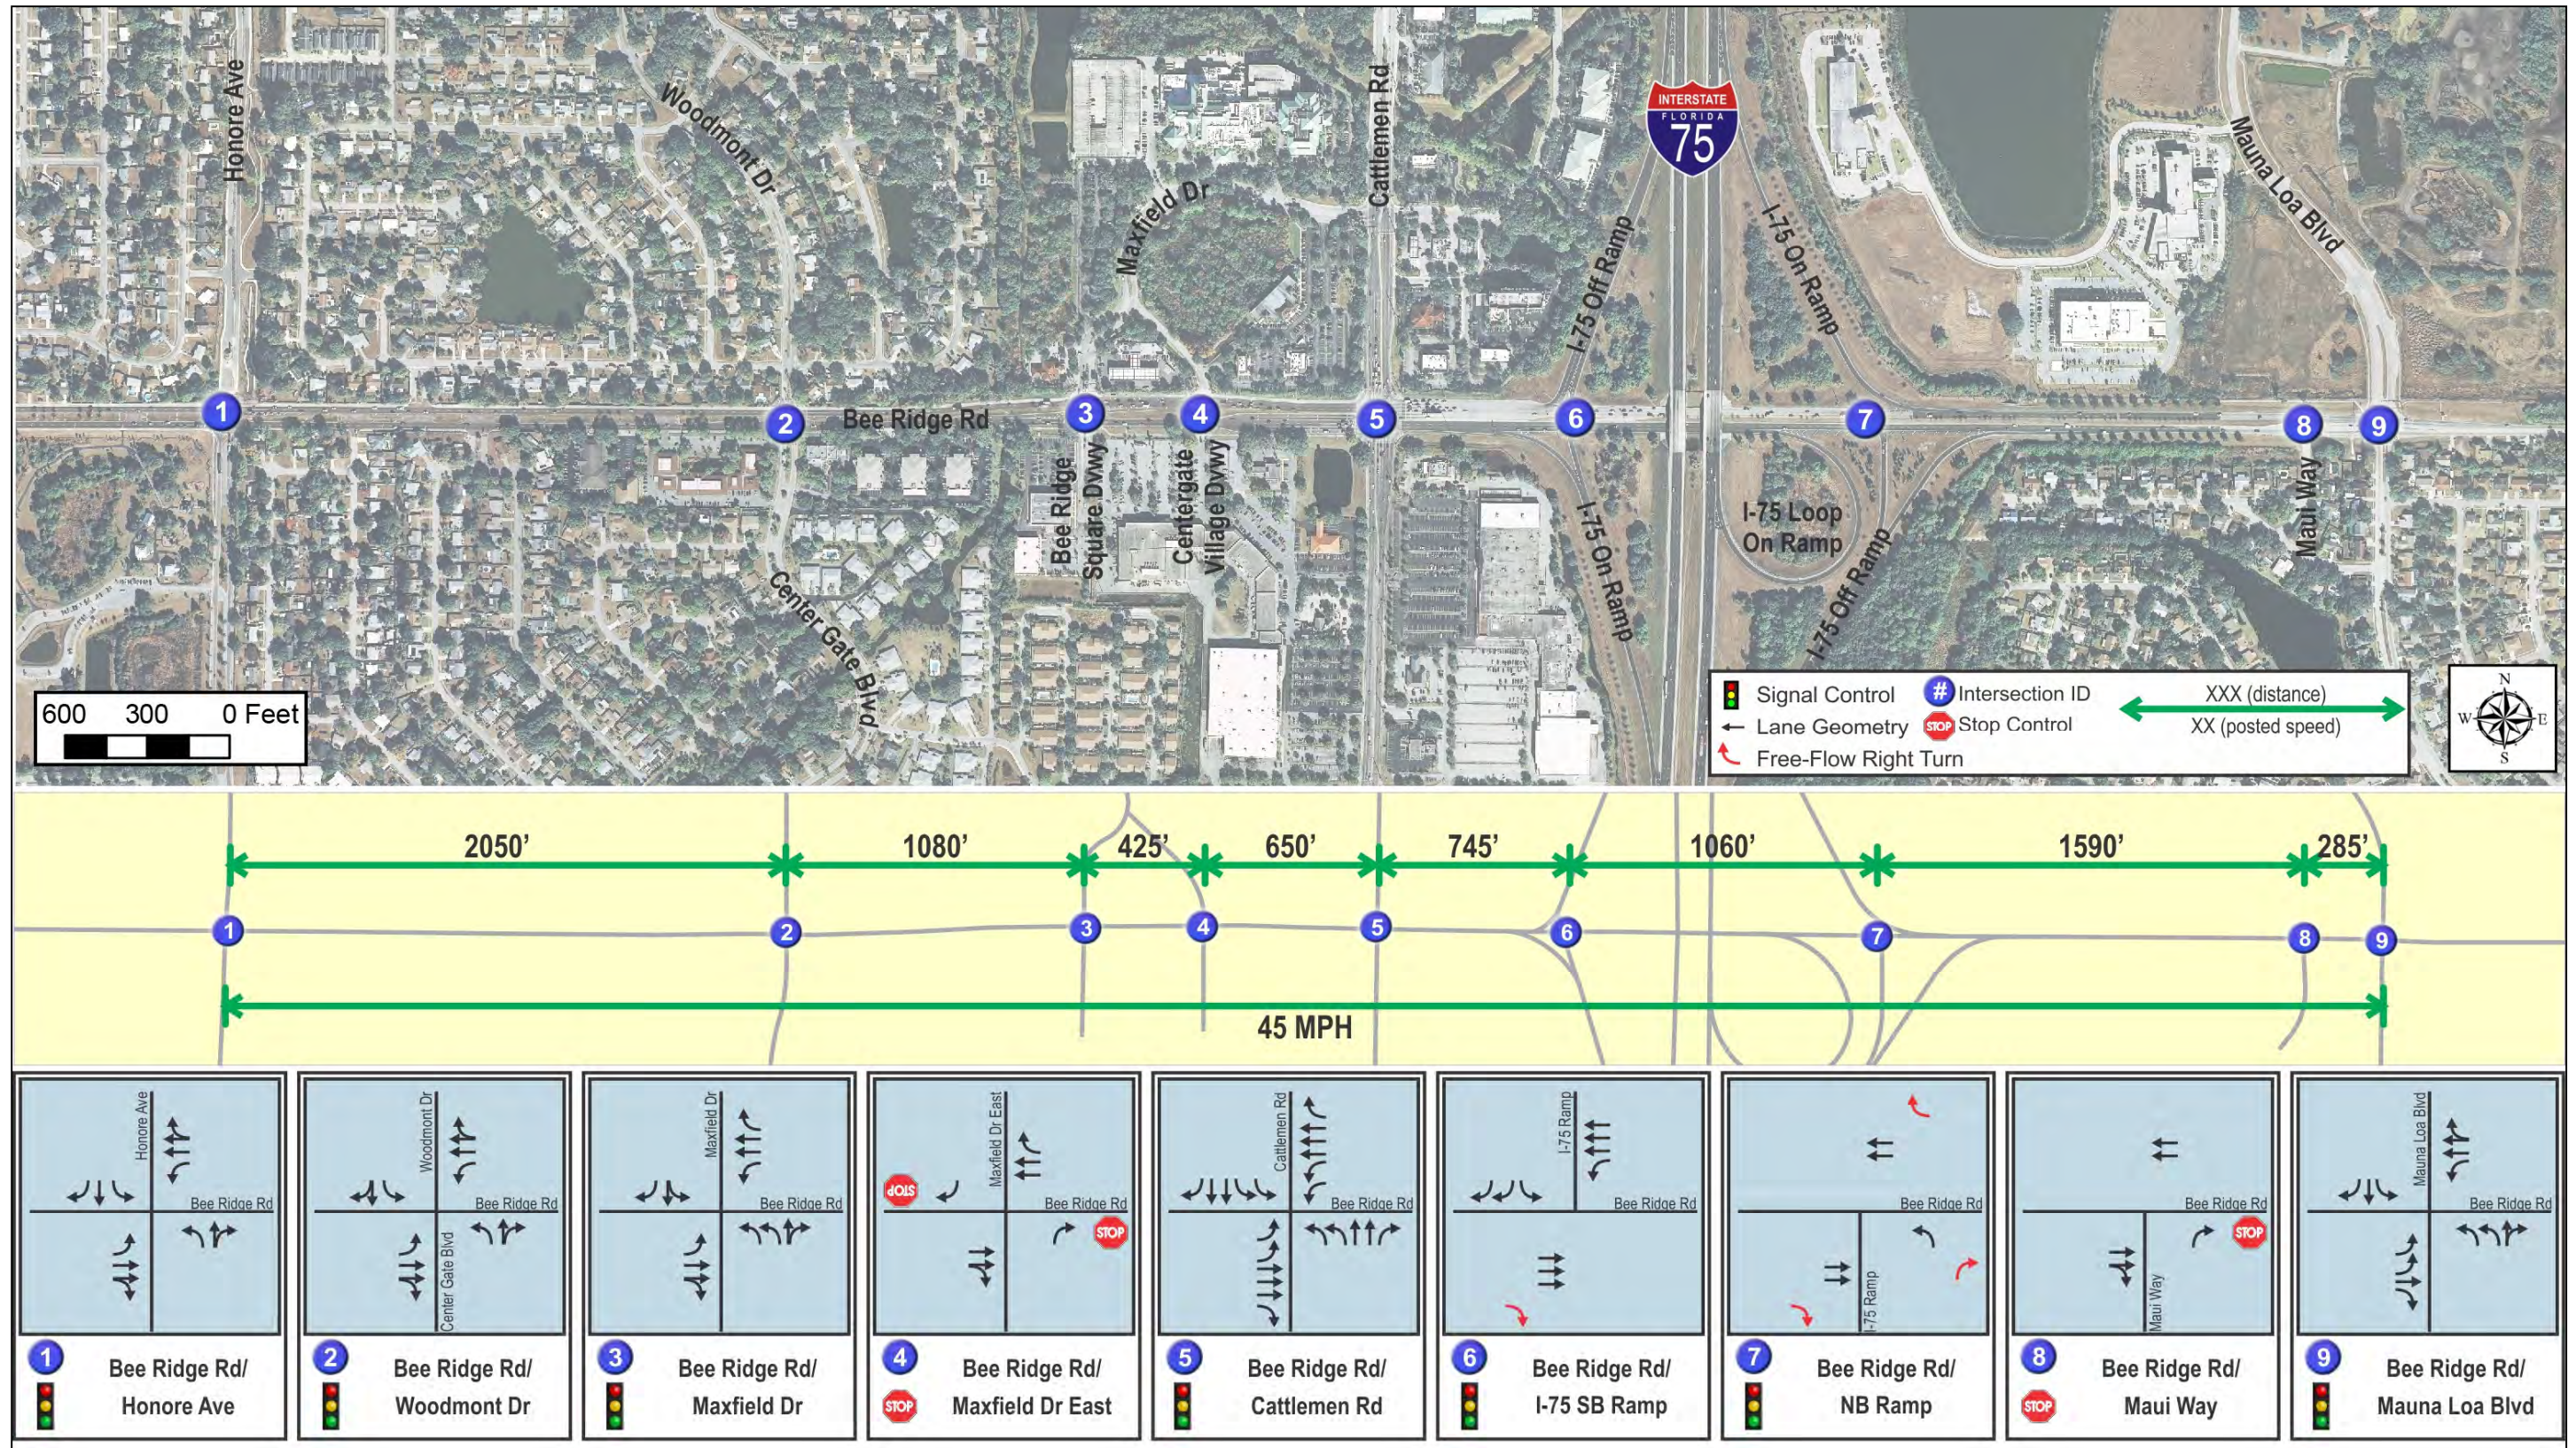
Existing Year (2013) Lane Geometry – Bee Ridge Road
